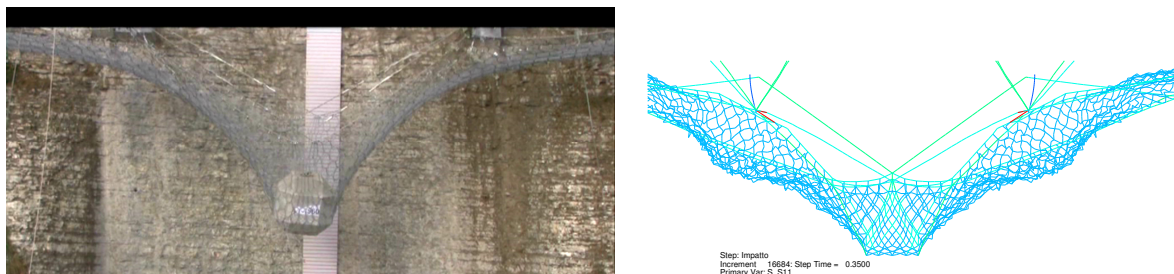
Physical and numerical modelling of a falling rock protection barrier prototype in a vertical-drop test site
